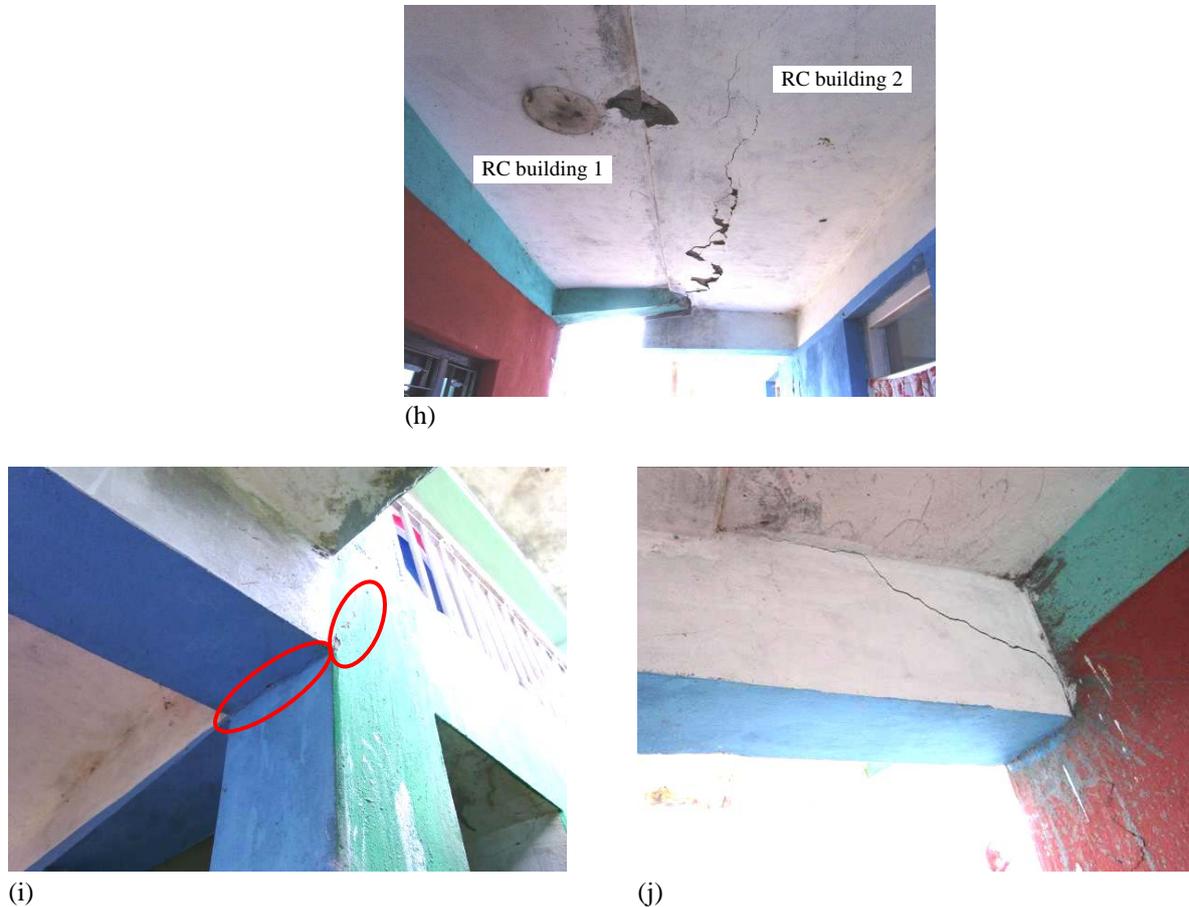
Collapse of stone masonry building due to structural pounding: (h) induced cracks on the slab of RC building 2 due to structural pounding; (i) shear cracks in the beam-column joint; and (j) shear crack on the beam.
